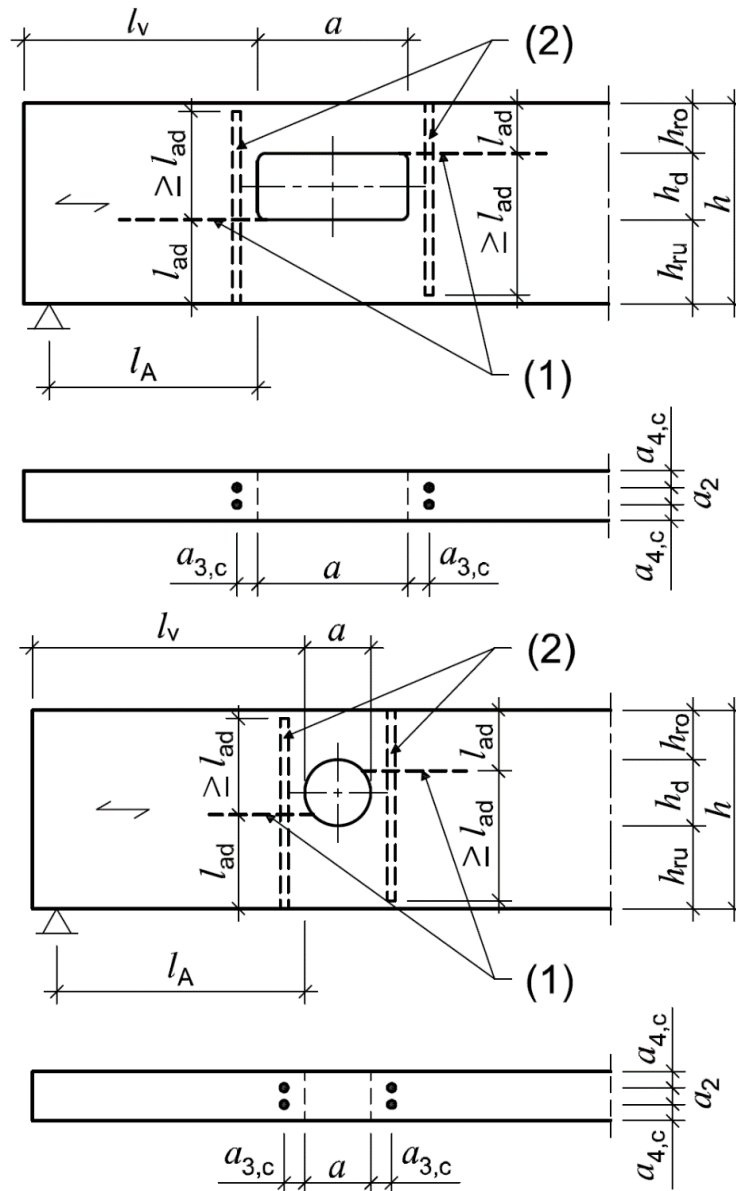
Reinforcement of openings with internal glued-in steel bars [19]
